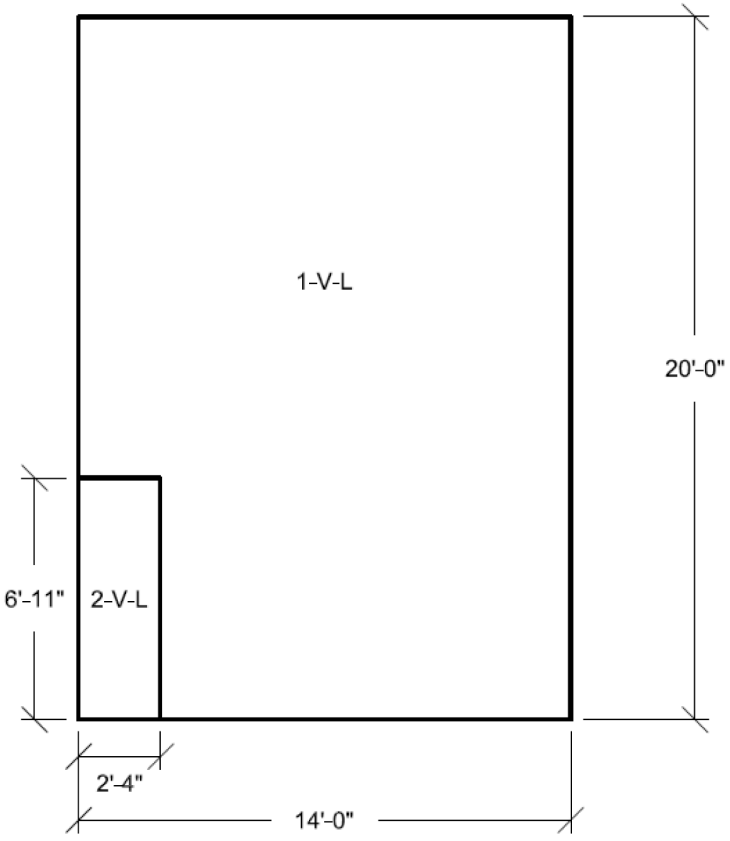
H.6-174 DGFOV Wall 9 Looking From Outside Vertical Reinforcement Zones Near Side Face
